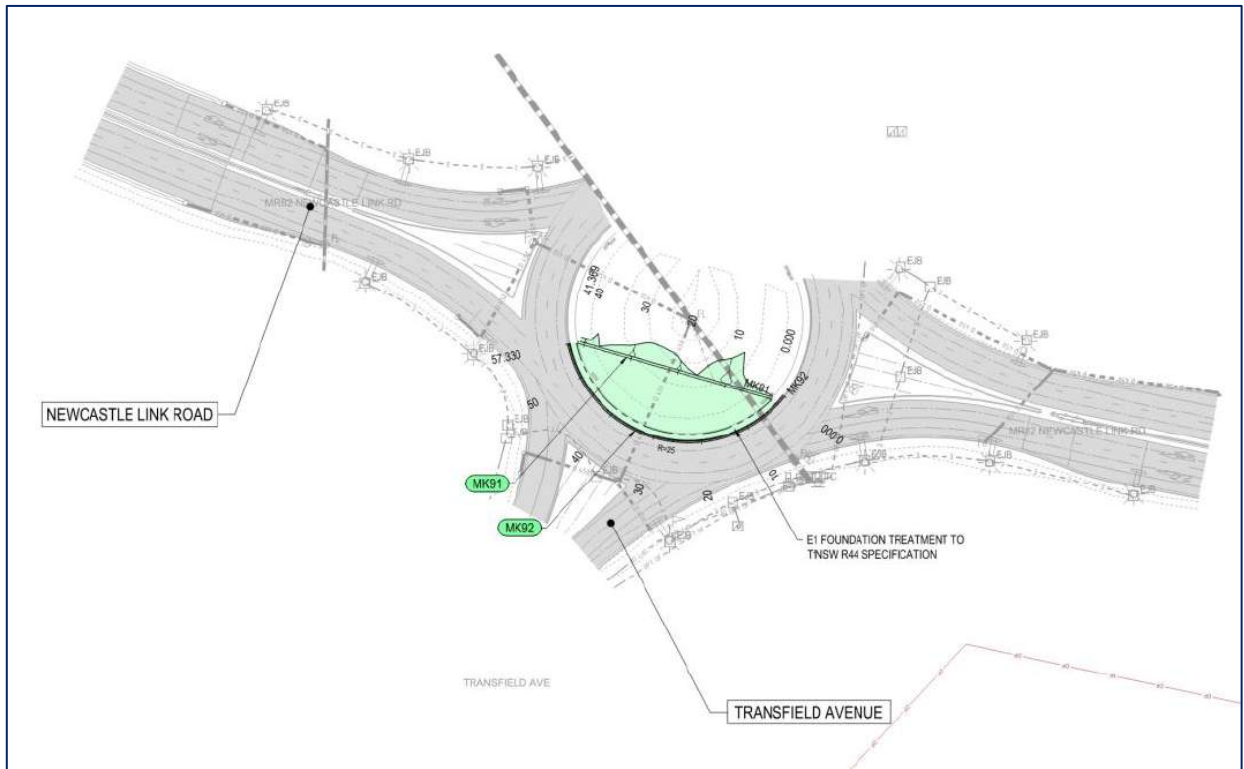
Site 9 proposed works at roundabout on Newcastle Link Road intersection with Transfield Avenue
